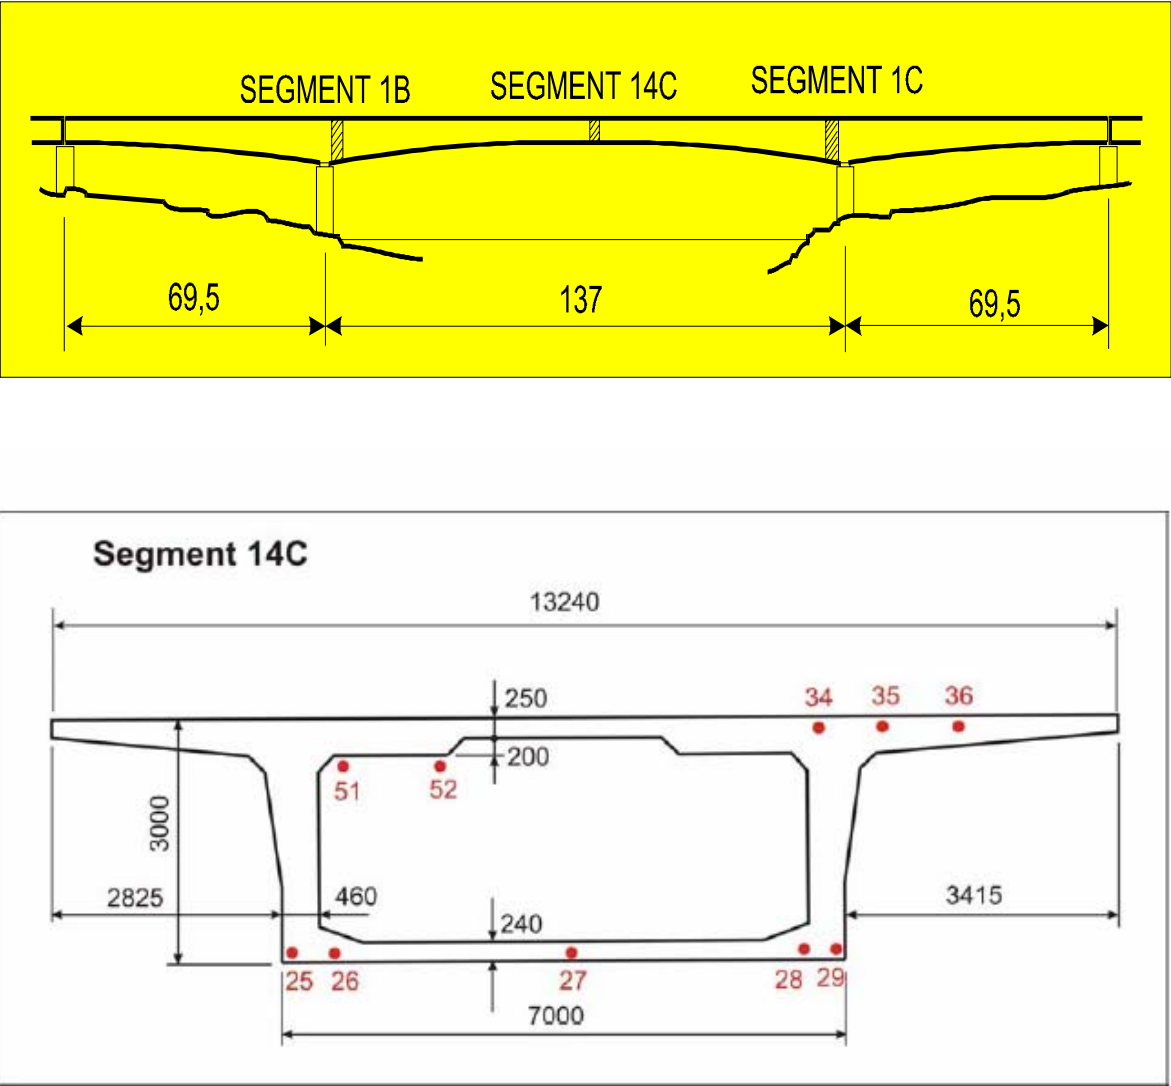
Bridge across the Ohře river: a) elevation, b) mid-span segment
